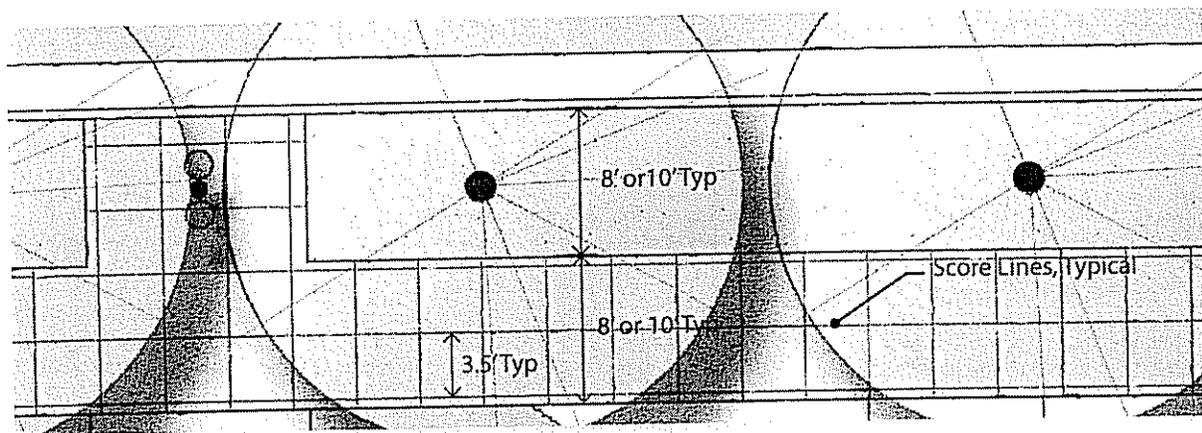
Typical Sidewalk Paving with Linear Planting Strip
